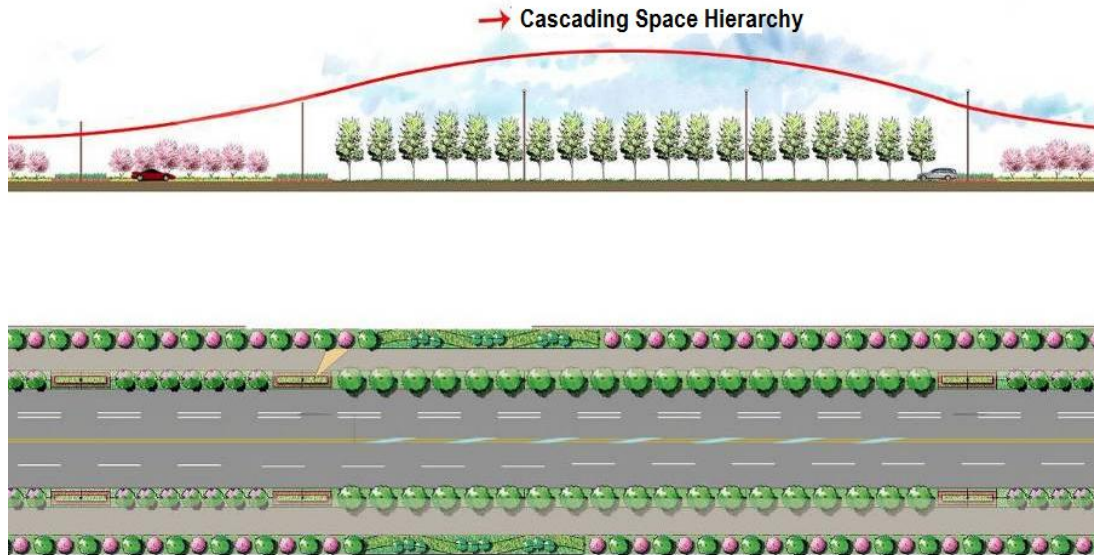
Standard Demonstration Section of Industrial Avenue Landscaping Works
